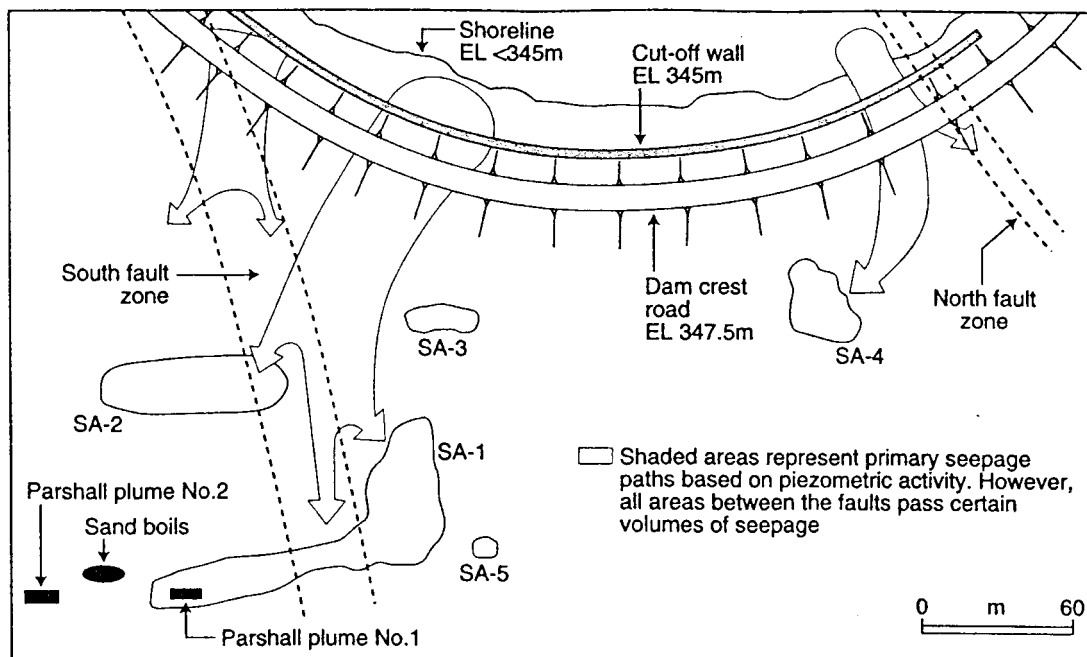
Beaver dam: Location of major seepage features and of cutoff wall
